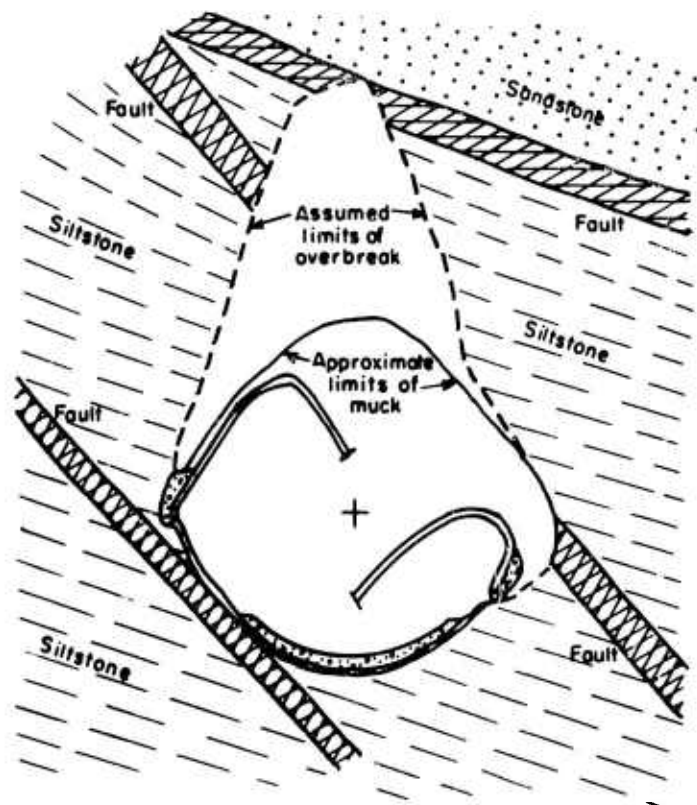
B POSITION OF ARCH-RIBS AFTER COMPLETE FAILURE - ANGELES TUNNEL. (after Arnold et al., 1972)
